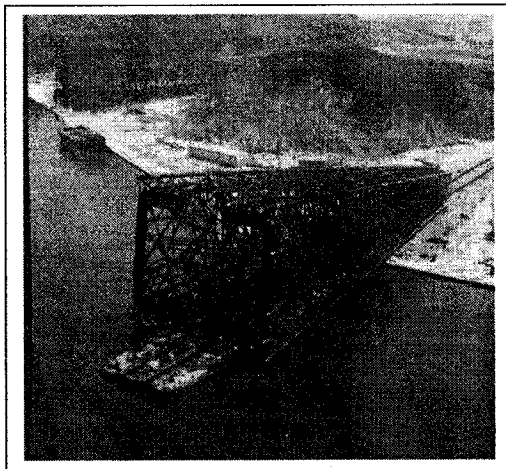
Jacket Load out (Skidding System) [Ref: Hyundai brochure 2000]
